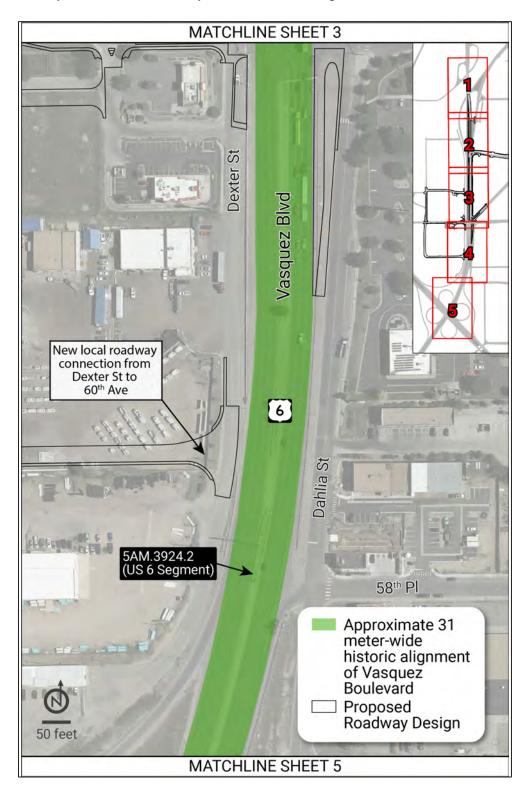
Vasquez Boulevard Proposed and Existing, Sheet 5
